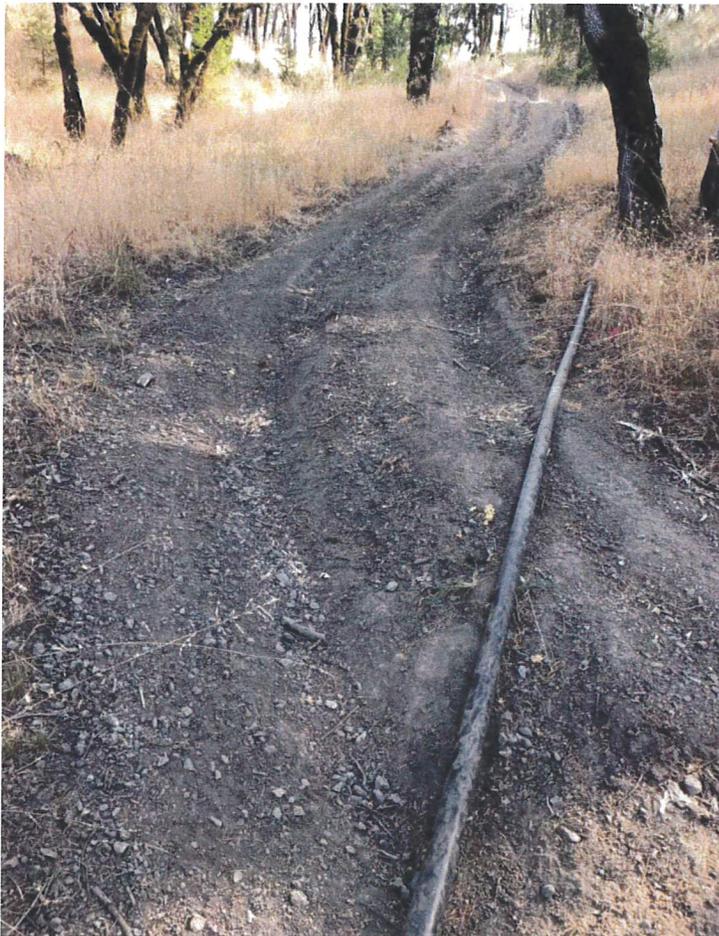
Base of Road 3 where it connects with Road 2 where the upslope road will be decommissioned.
